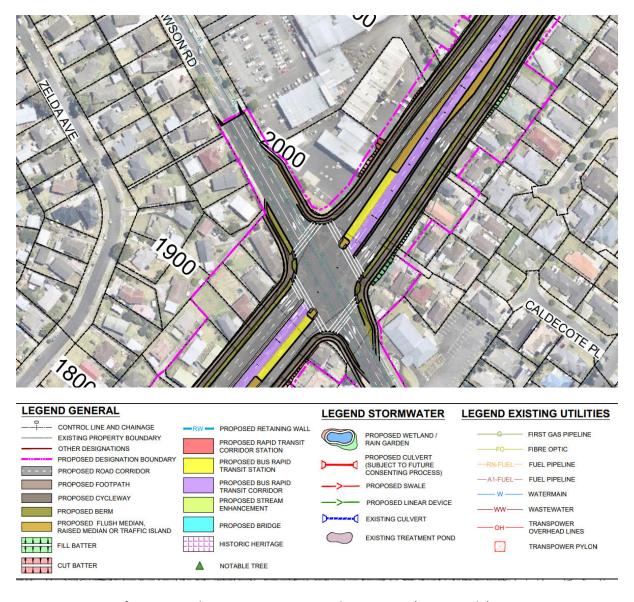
Excerpt from General Arrangement Layout Plan – NOR 2 (not to scale)
